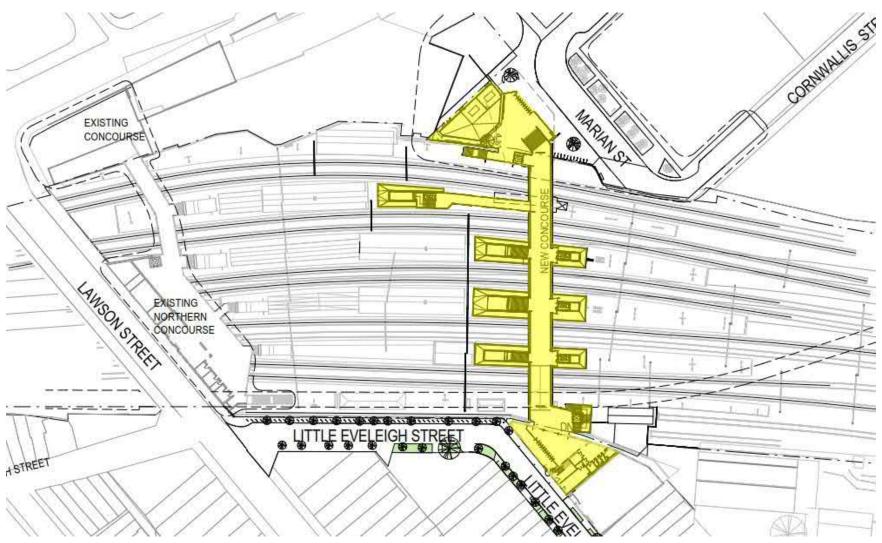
Site plan (Areas in yellow are new build) (full version of this plan is presented in Appendix H)
